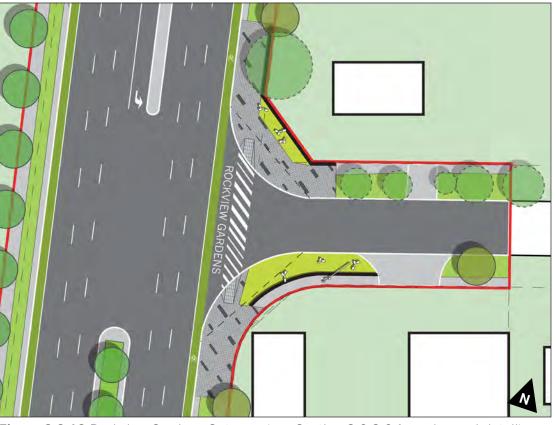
Rockview Gardens Gateway (see Section 3.2.3.2 for enhanced detail).
